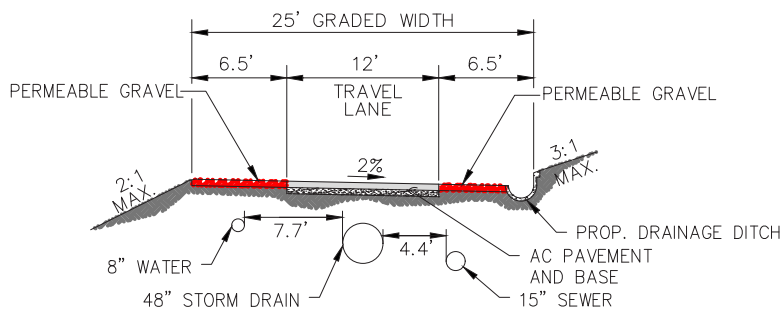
25' Easement and Utility Access Road (TM Street Section 14)
